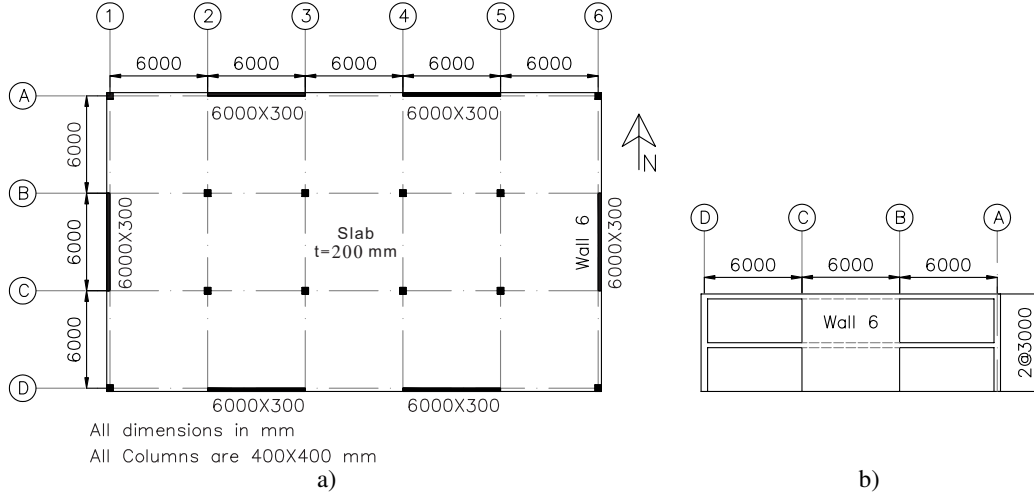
Prototype building: a) Plan view; b) Transverse elevation view
